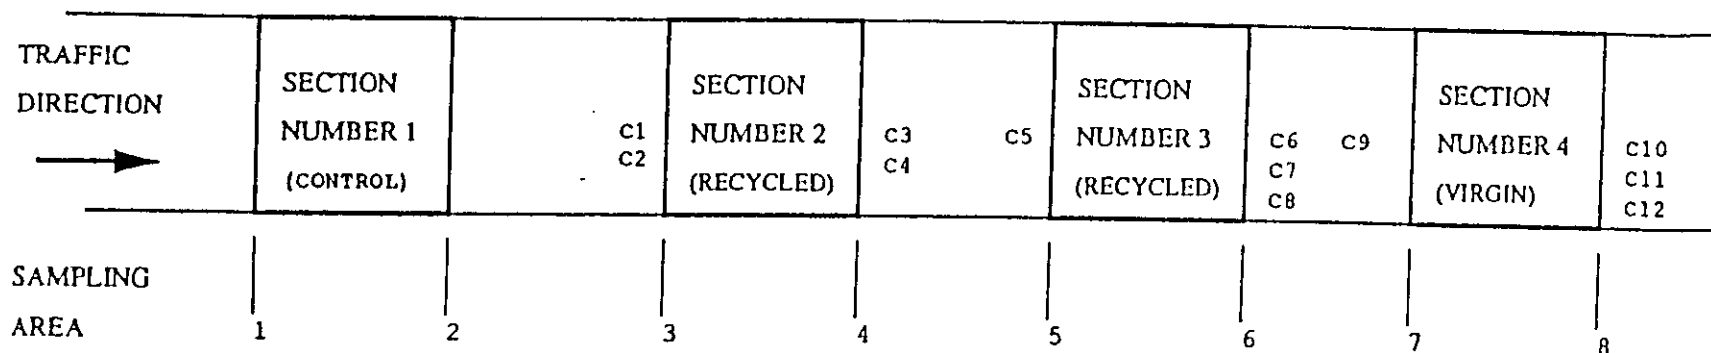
SPS-5 SITE LAYOUT AND SAMPLING LOCATION (POST CONSTRUCTION)
